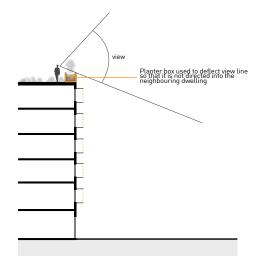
C.6-5: Incorporation of planter boxes into walls or balustrades of roof terraces
